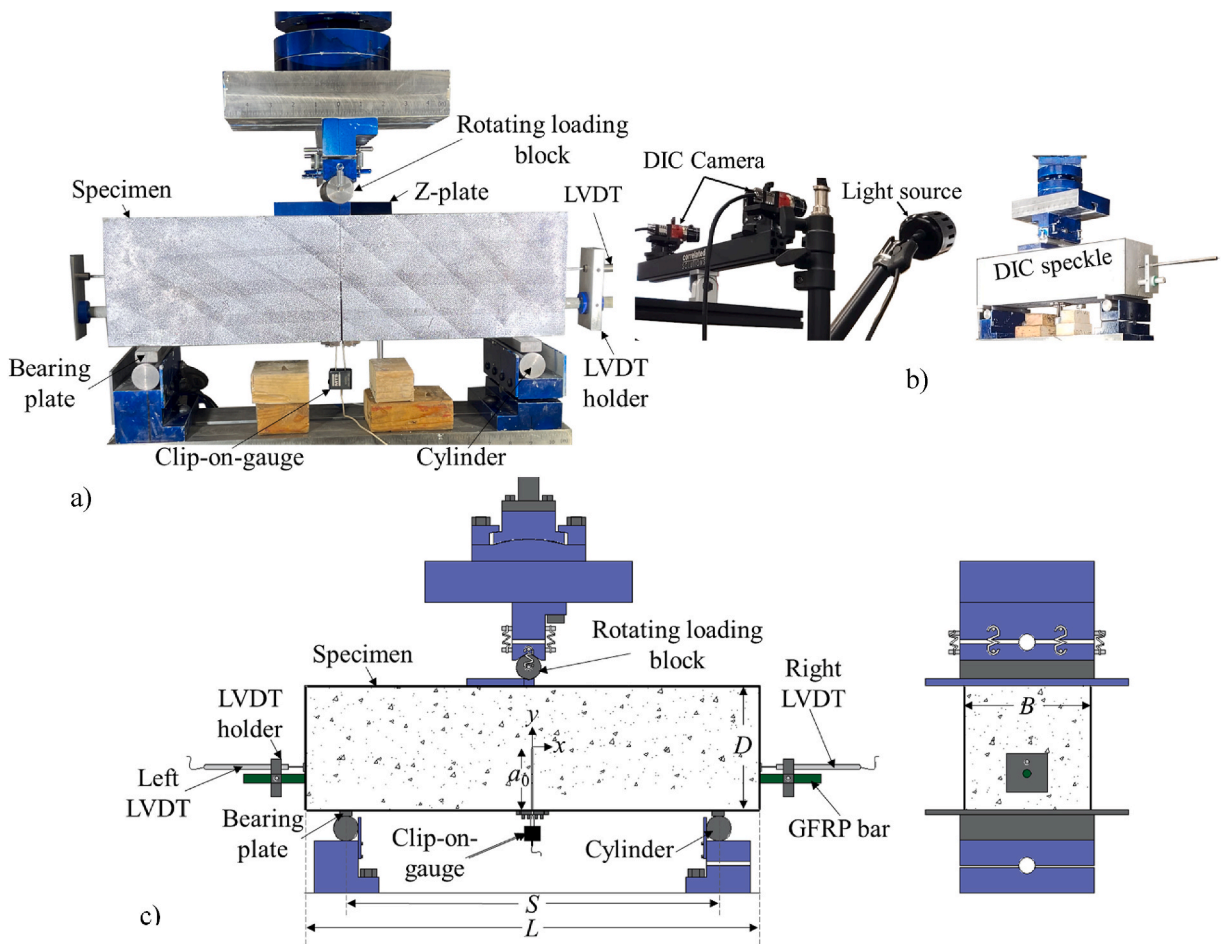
Three-point bending test setup: a) actual photo of a test specimen; b) DIC setup; and c) a schematic of the test setup.
